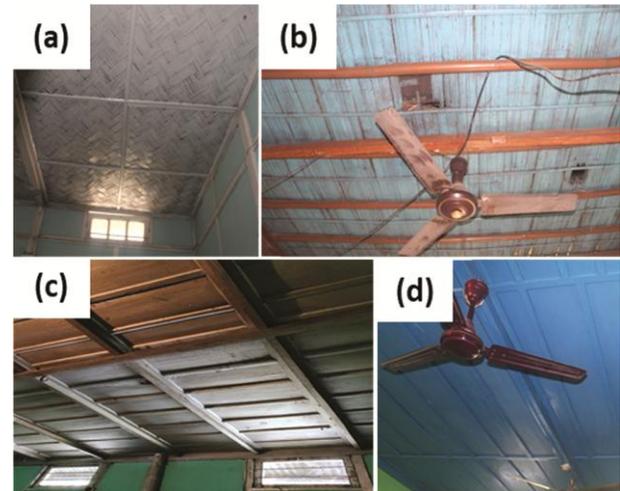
(a) & (b) woven bamboo ceiling (c) & (d) timber ceiling
